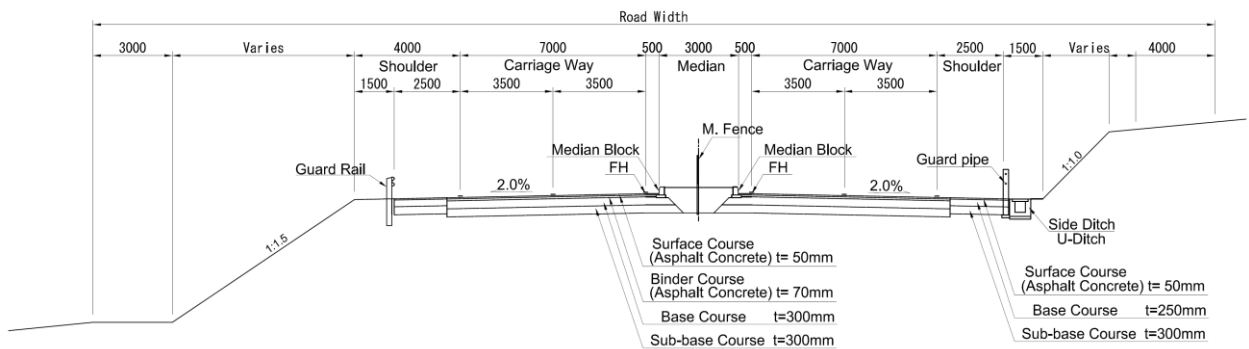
Drainage Facilities at Cut Sections Where Service Tracks are not Provided
